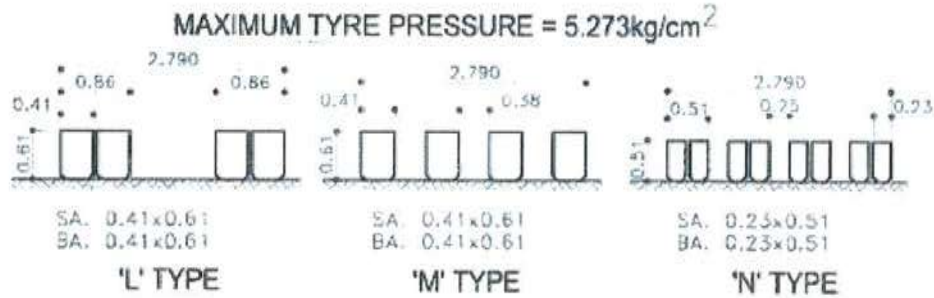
Class 70R Wheeled vehicle. Axle and bogie loading (dimensions in m).
